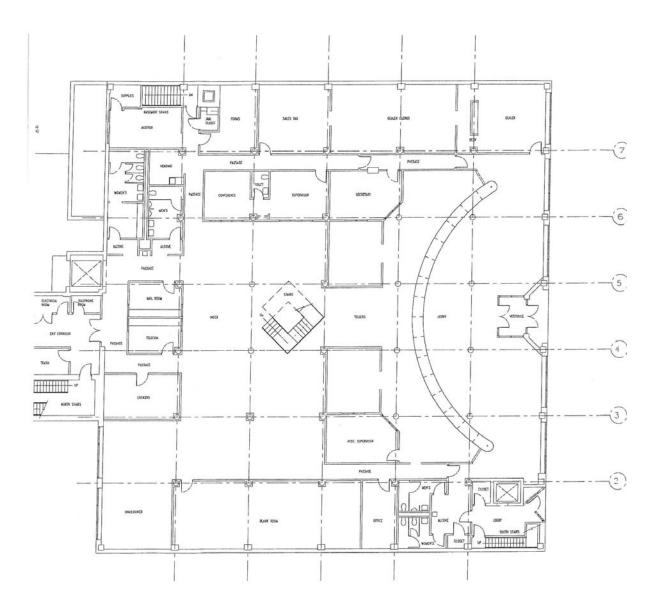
Bryant Building, c.1990, first floor renovation plans. Cuyahoga County Title Bureau
